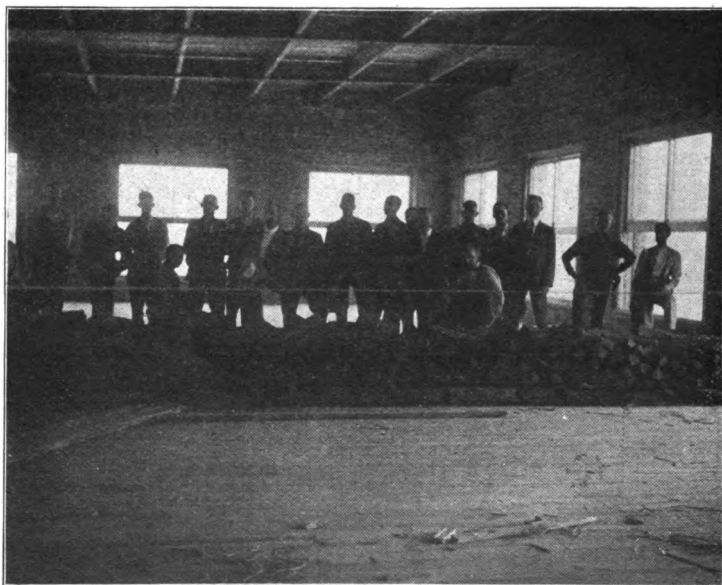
Test of Girder of 27 feet span at the Davis Sewing Machine Company's Office and Ware-house. Load, 124,000 pounds.
